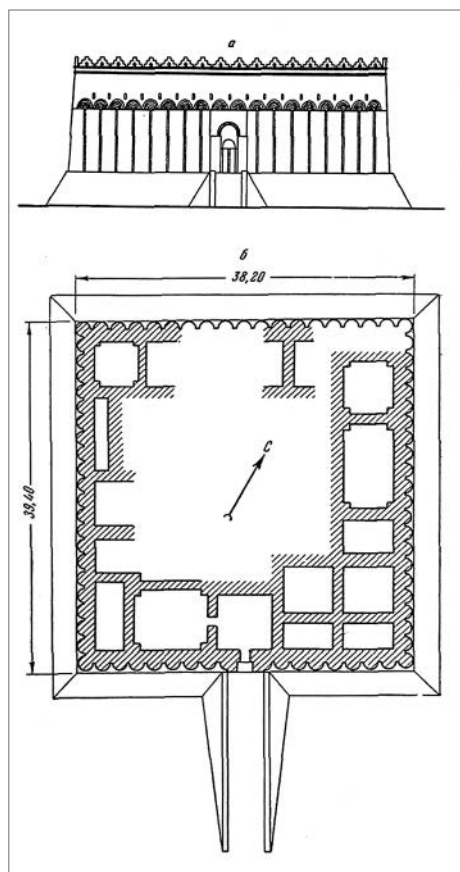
Great Nagim Kala in Merv Oasis: reconstruction of the facade and plan (After Pugačenkova 1958: 133)
